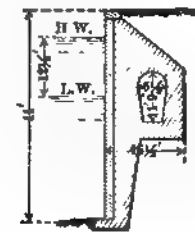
Section of North Wall of Lock at Little Falls, N. Y. (Mohawk River, 1911.)
